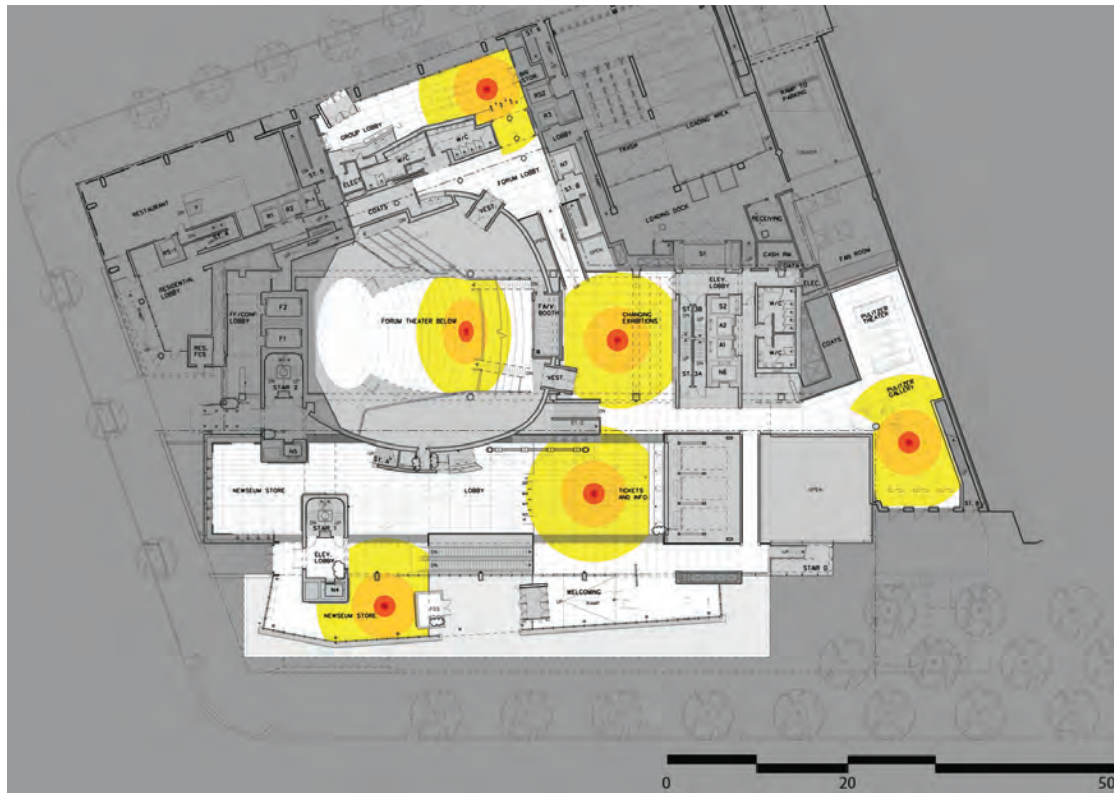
Newseum first floor plan at grade level at the entrances.
